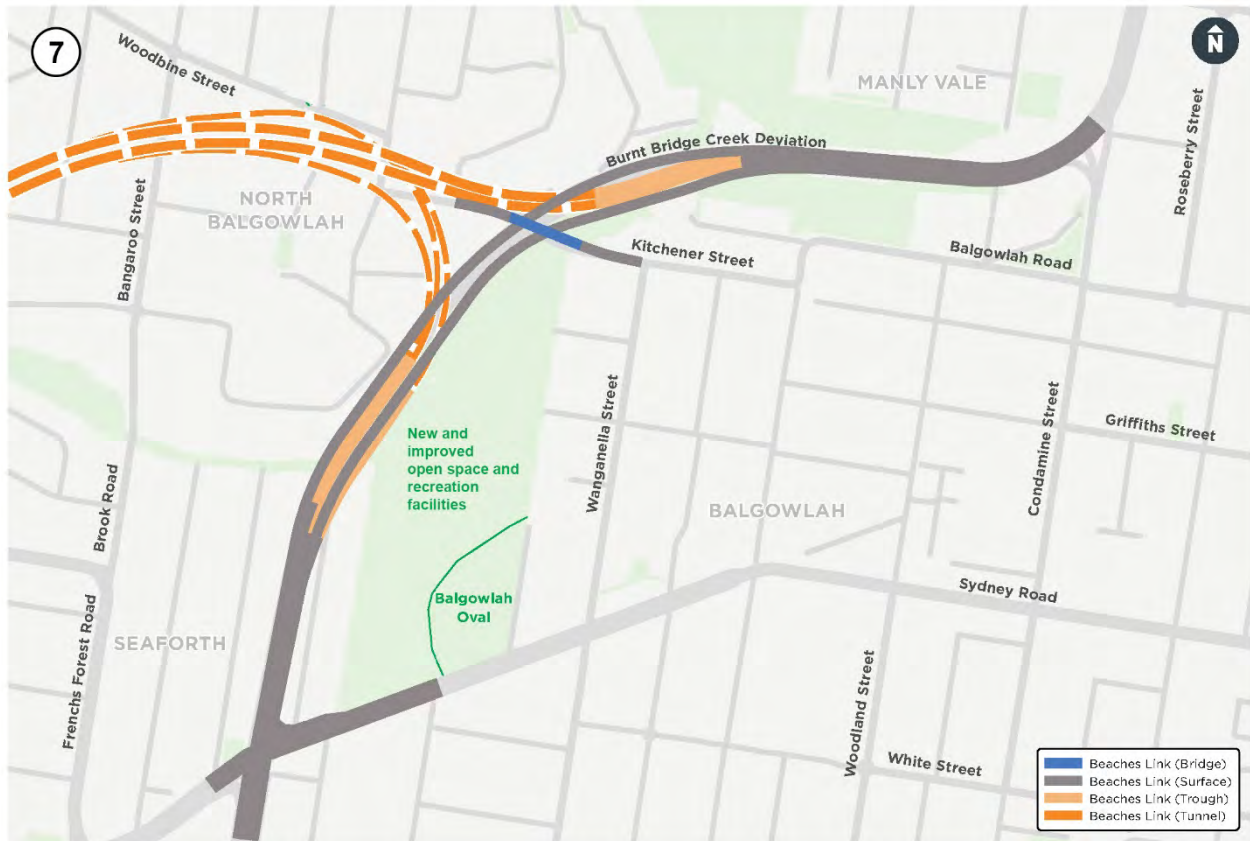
Alternative 7 - North and south facing tunnel ramps to Burnt Bridge Creek Deviation
